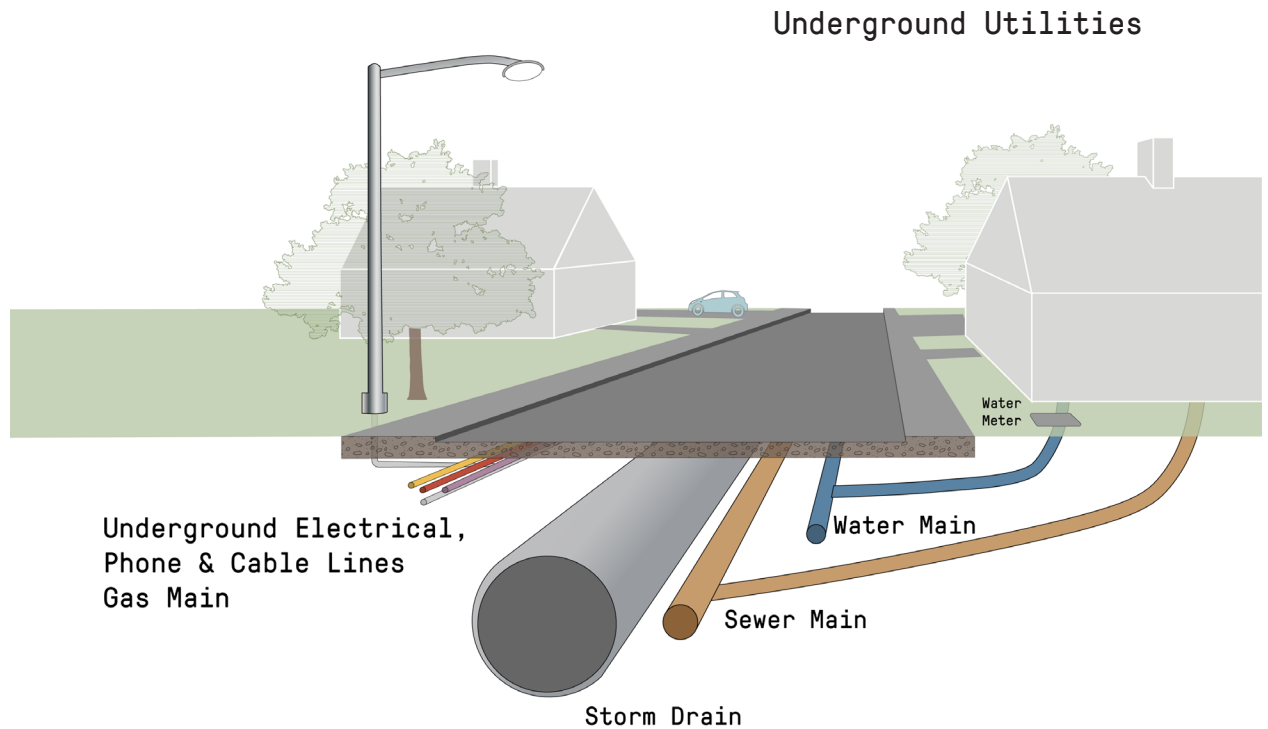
Underground Utilities. Be careful to check for underground utilities before planting a new tree.
